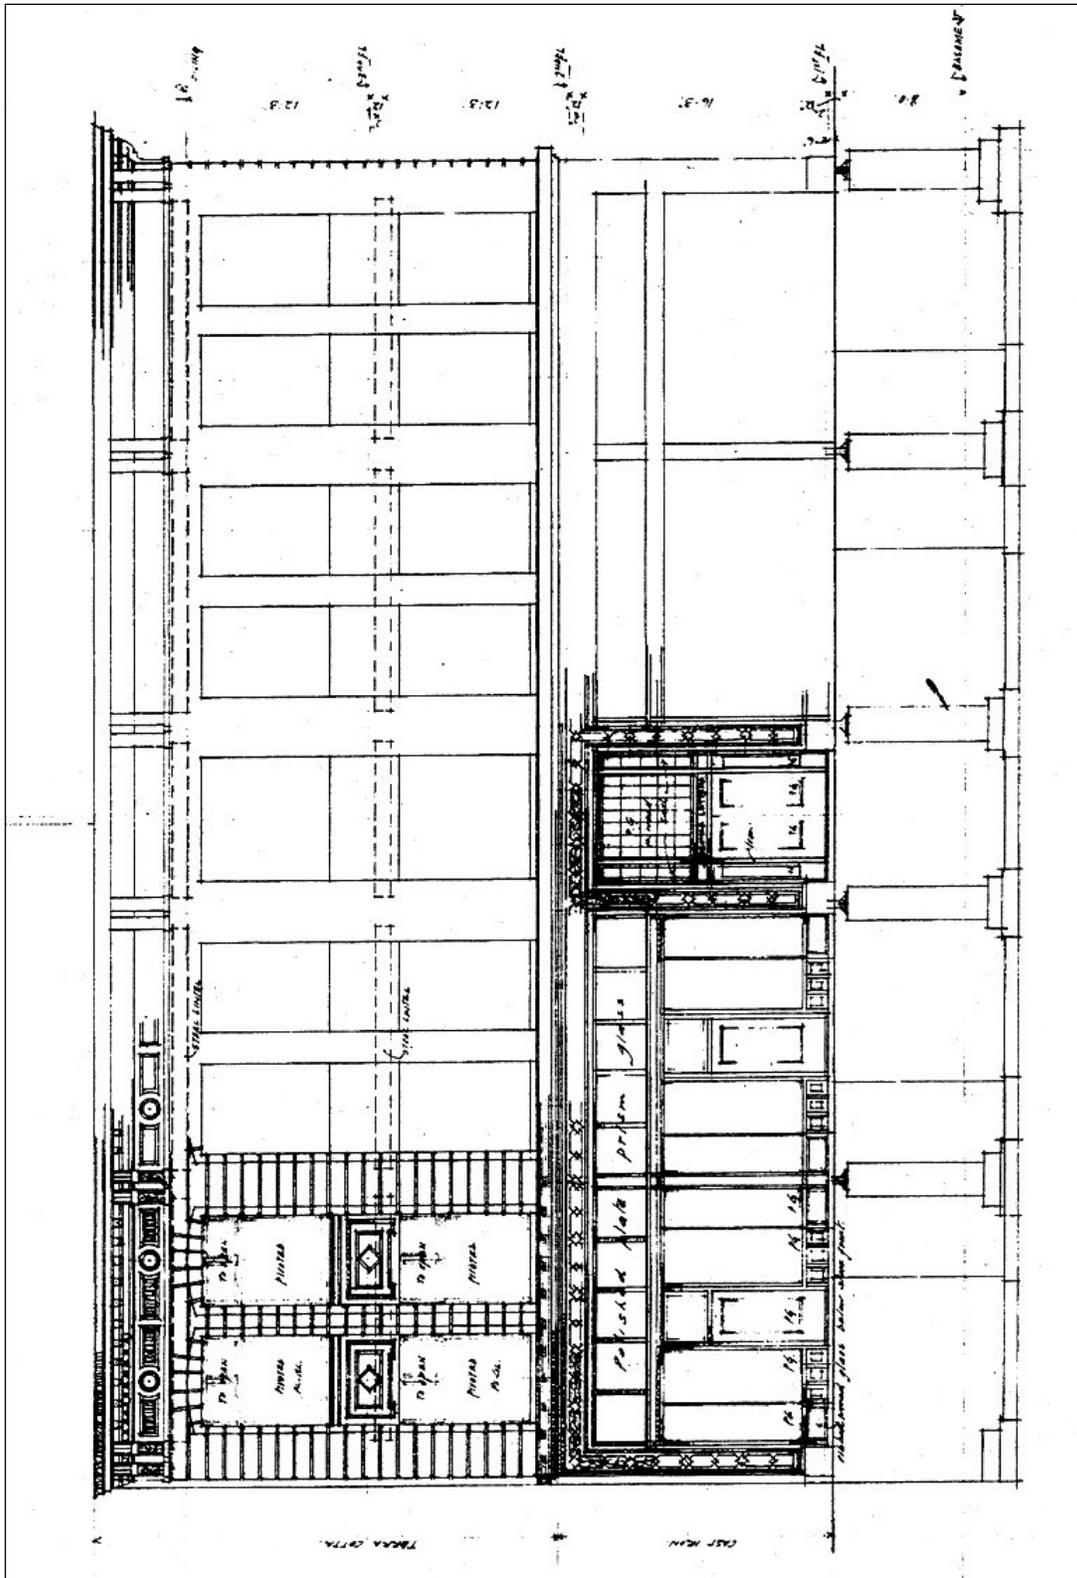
Architect’s plans, “Elevation to Portage Avenue,” 1912. (Courtesy of City Archives, Plan #1399/1912.)
